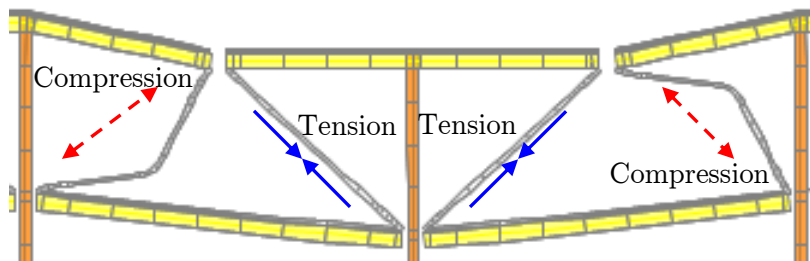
Uneven column force in 2D frame caused by N-brace belt truss
